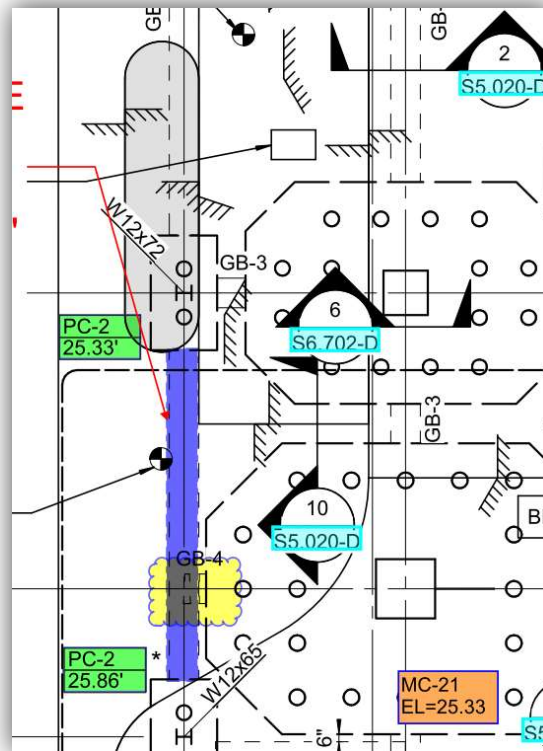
shows the location of edge in plan in yellow that cannot be constructible
